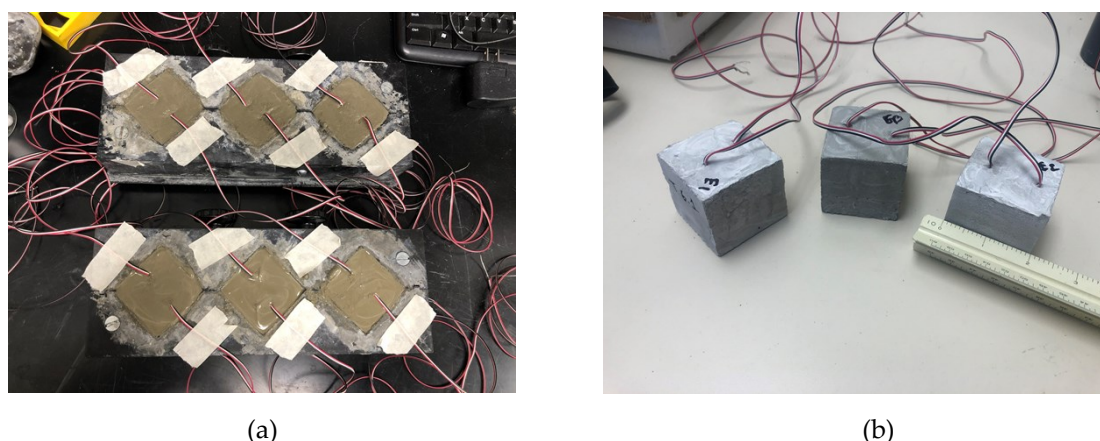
Test samples: (a) The cubic molds for fabricating samples; (b) Samples embedded with electrical wires after curing.
